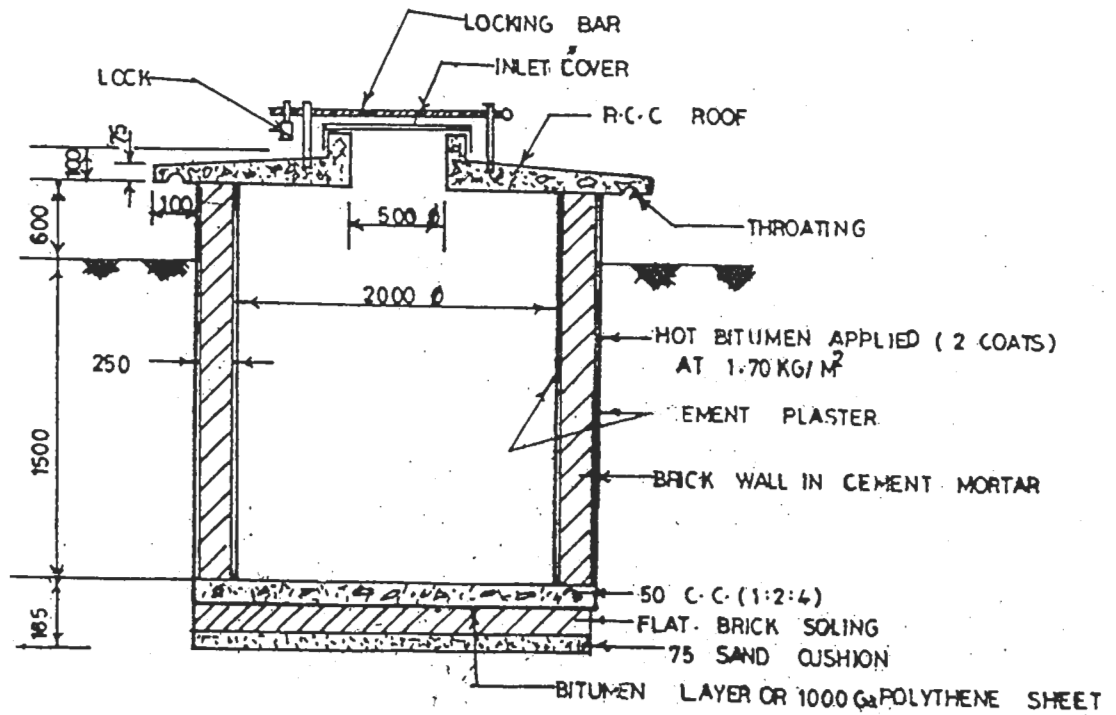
Under ground Brick Masonry Structure Capacity 6.6.M³ or 5.0MT
